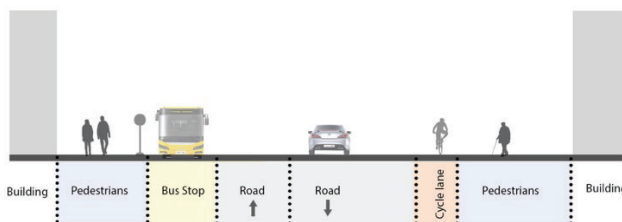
The street section of Oxford Road shows traditional bike lanes (Source: Author)
